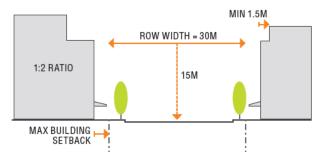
Strong street definition is created by appropriate scale, minimal building setbacks and consistent street walls
